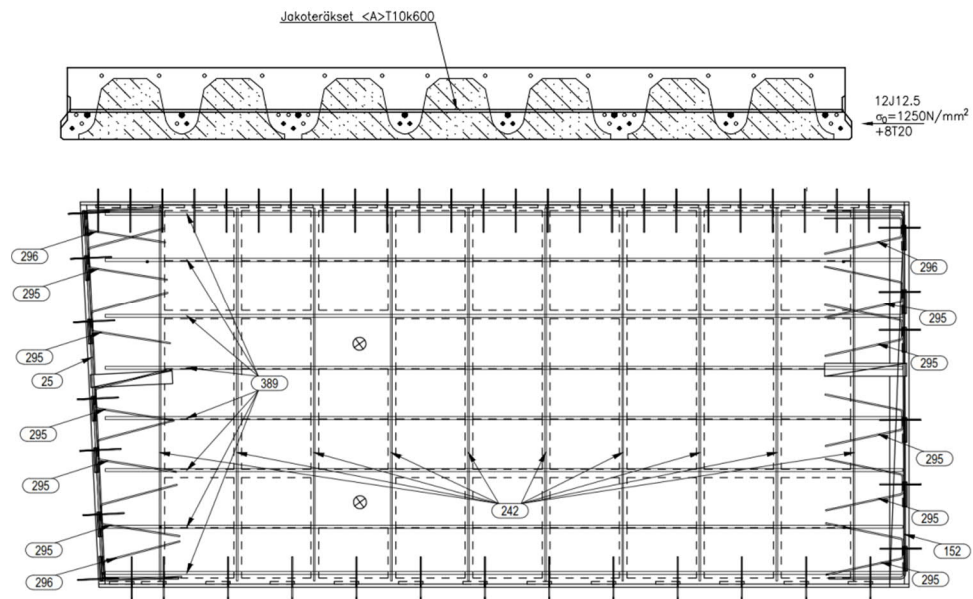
Reinforcement drawing: cross section view (top); top view (bottom) (Lujabetoni Oy, PDF-file snapshot)
